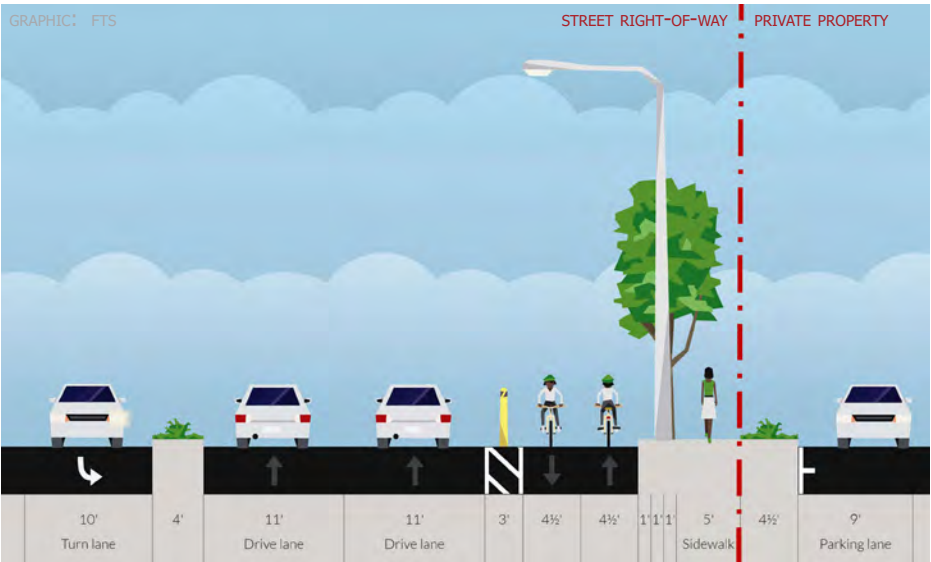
D.2 EUCLID STREET PARTIAL CROSS-SECTION DIAGRAM APPROXIMATELY 300 FEET SOUTH OF CONDOR AVENUE - CONCEPT REPLACEMENT OF EASTERMOST NORTHBOUND TRAVEL LANE WITH A 2-WAY CYCLE-TRACK, ALONG WITH A NARROWING OF ONE TRAVEL LANE FROM 12 FEET TO 11 FEET.
